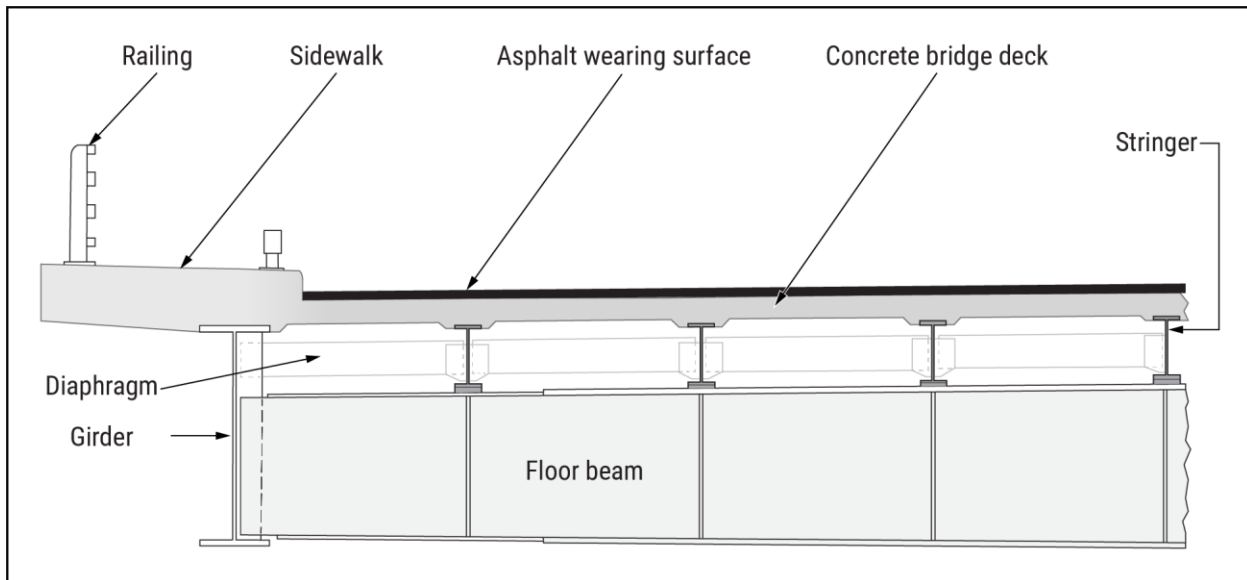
Half-section diagram of Fern Hollow Bridge.¹⁷
